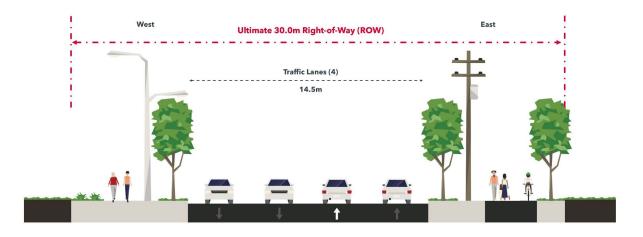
Example Cross-Section of a Four-Lane Road with a 30.0 Metre ROW
